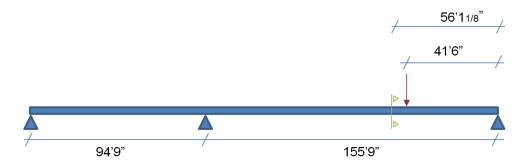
Critical longitudinal loading location and corresponding maximum response cross-section for the SR-589 Bridge over Hillsborough Avenue
